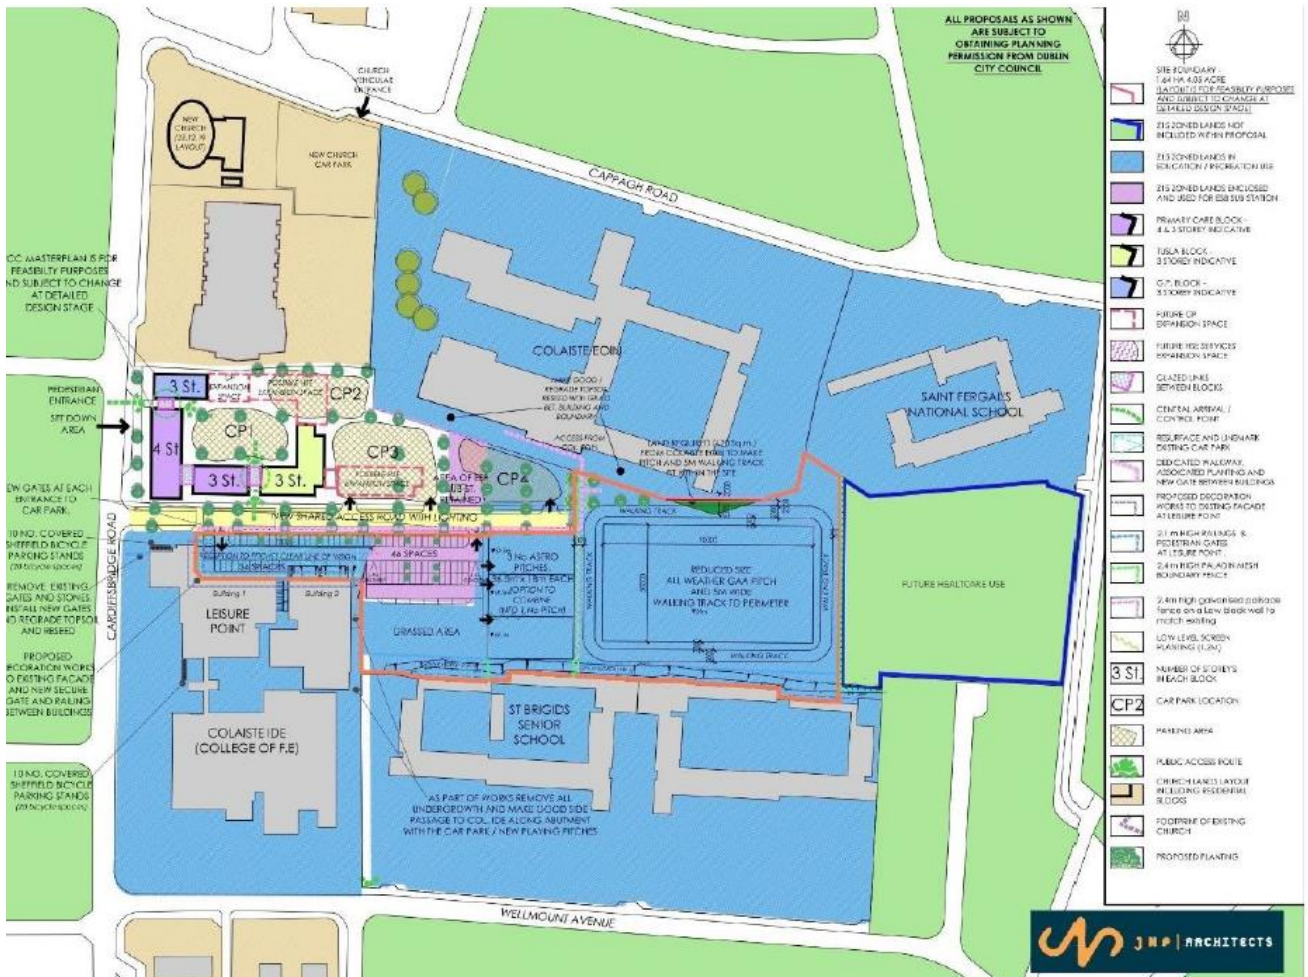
Layout Plan of Final Feasibility of Primary Care Centre and Recreation Facilities (Source: DCC, HSE, CDET, Archdiocese of Dublin)
